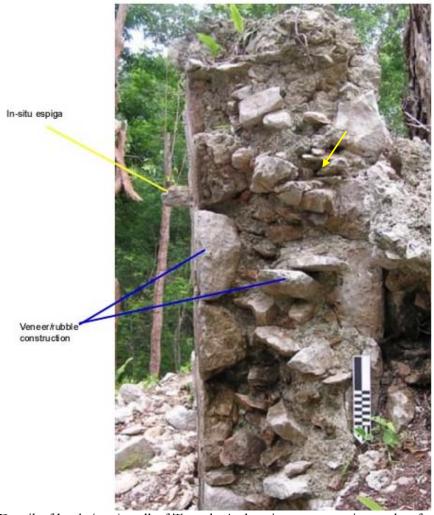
Detail of back (east) wall of Temple A showing construction style of walls and the *in-situ* tenon (courtesy of BRAP)
